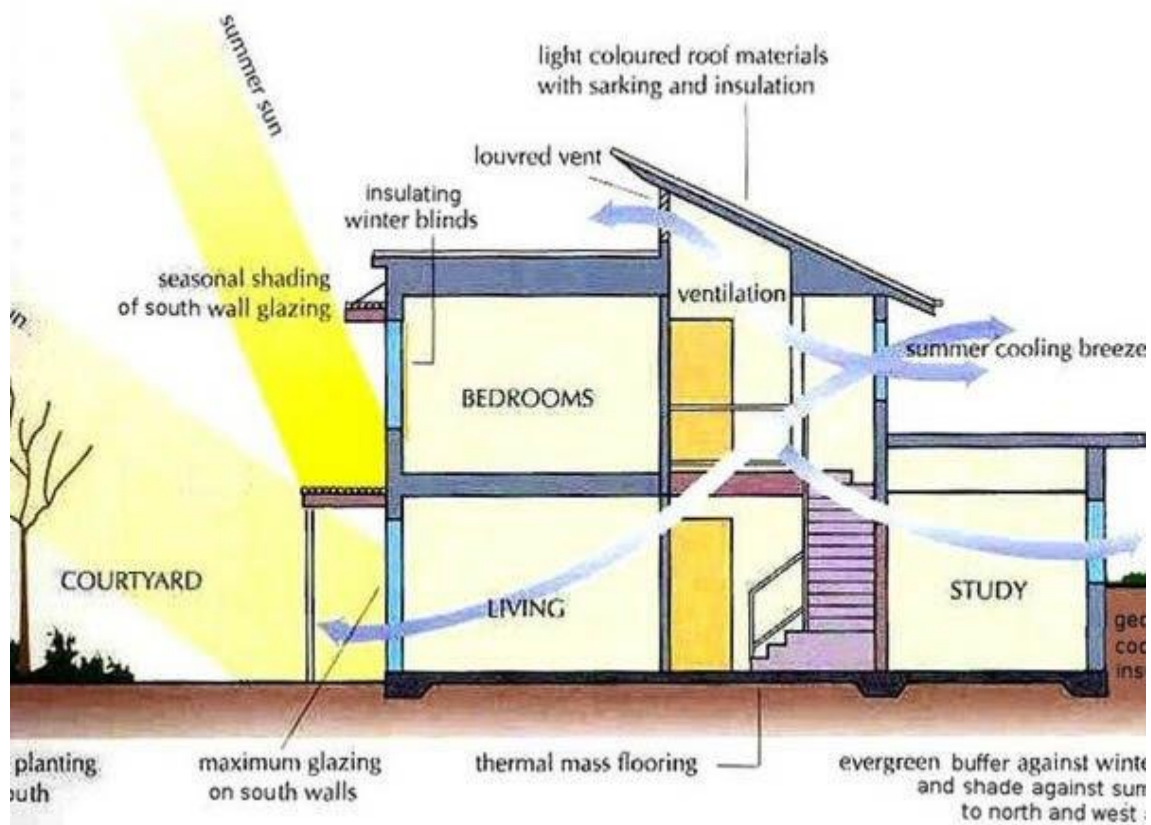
Elevation of a building with HVAC system.(source: www.greenbuilding.com)
